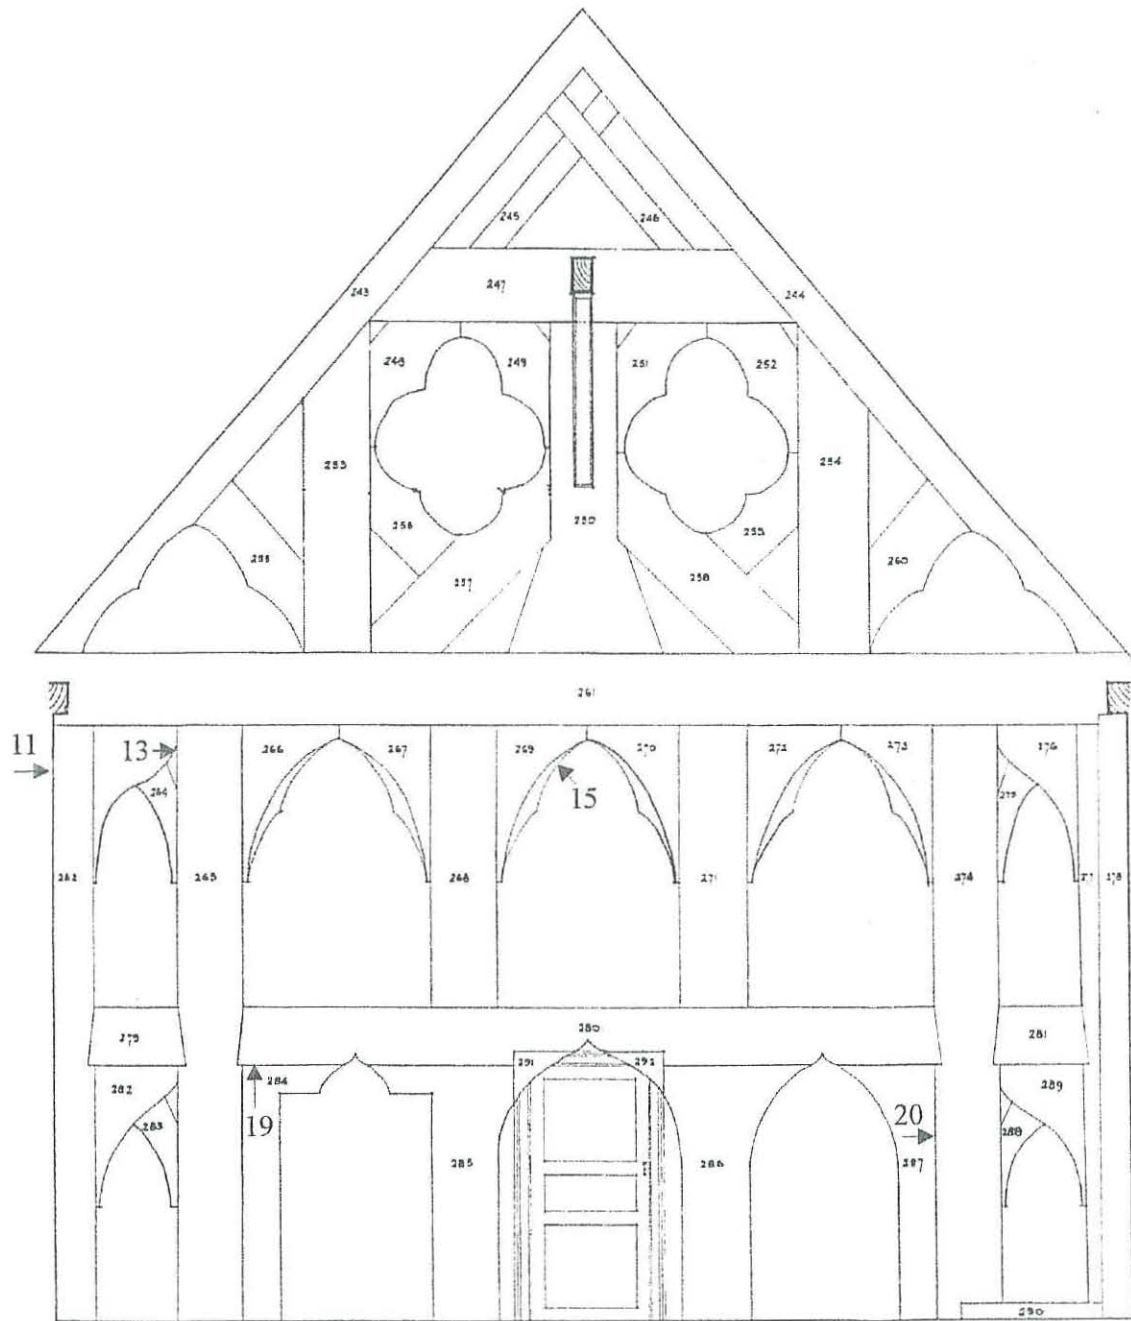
Internal elevation of north wall. Hall range, Baguley Hall. Location of samples 11, 13, 15, 19, and 20
